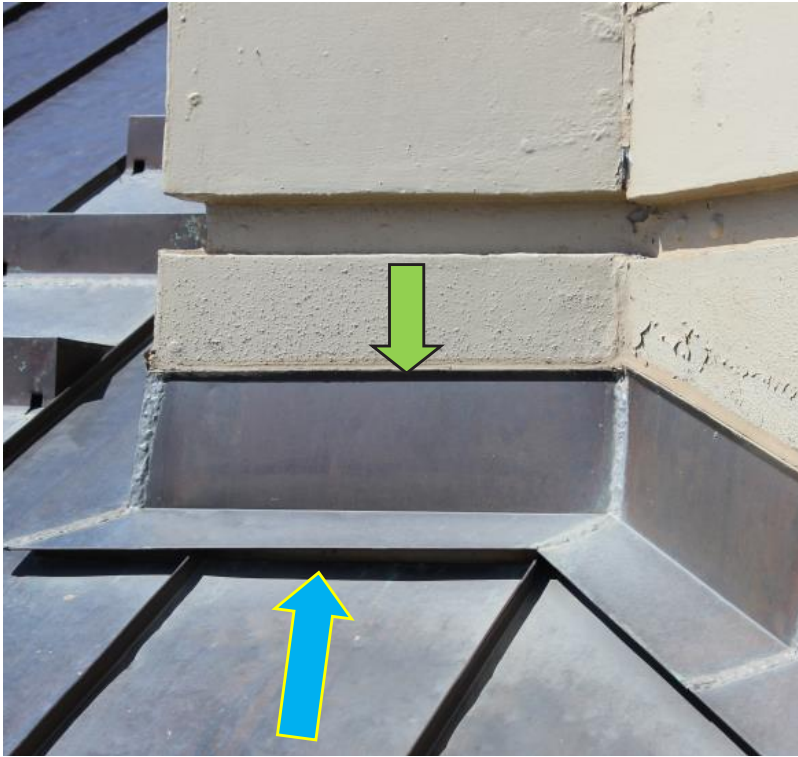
Existing Counterflashing Detail at Cast Iron Drum Base. The green arrow points to the surface-mounted counterflashing. This detail relies on the sealant at the top of the flashing. The blue arrow points to the counter flashing that is hooked onto the “Z” flashing. When this type of detail is used at a roof penetration such as a chimney or cast iron plate, no matter how good the soldering, precipitation will likely enter the assembly.
